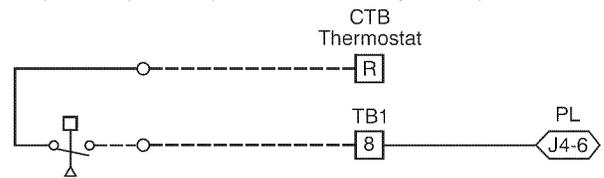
PremierLink Wiring Fan Pressure Switch Connection
